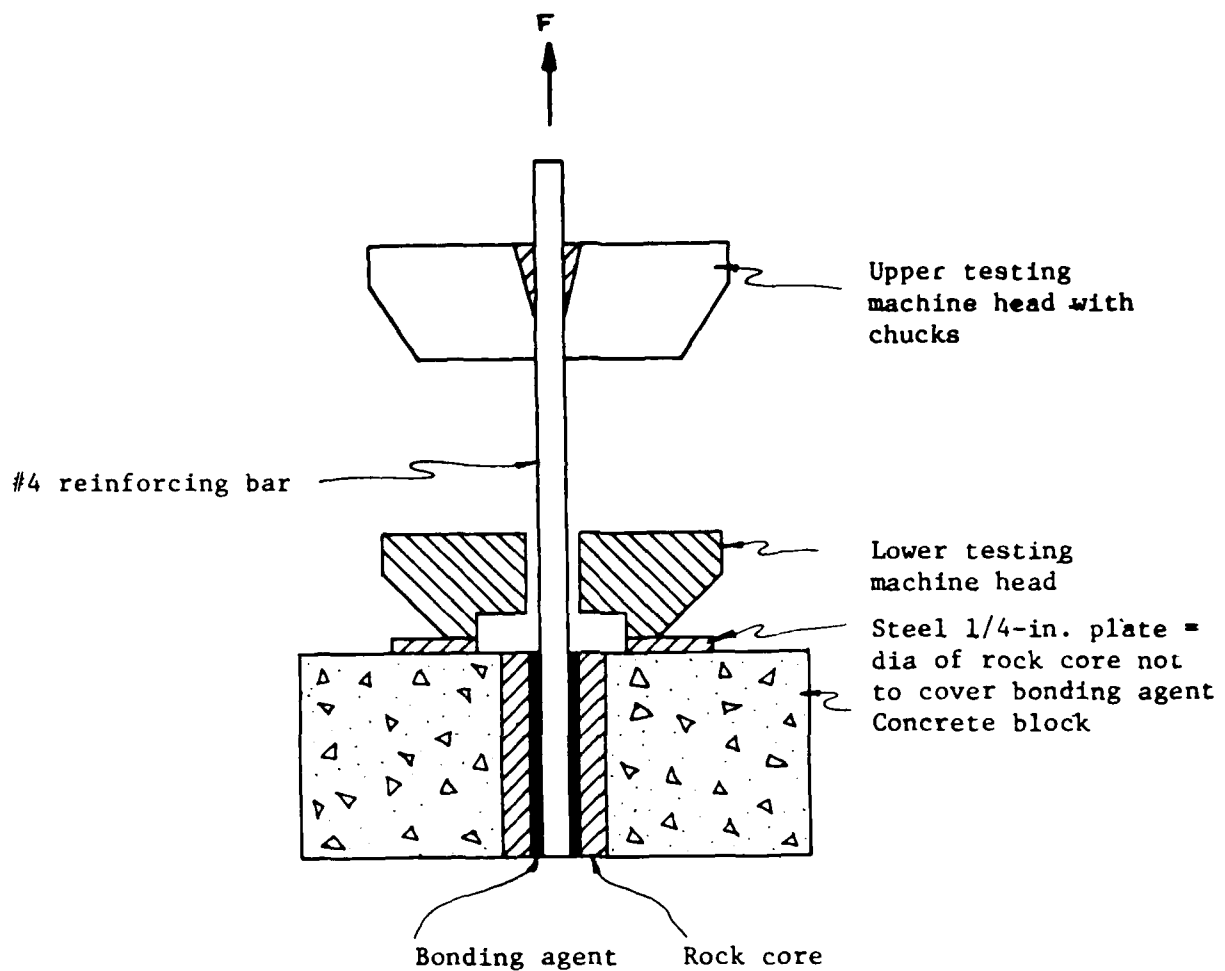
Section showing test configuration for the reinforcing bar pullout tests.
